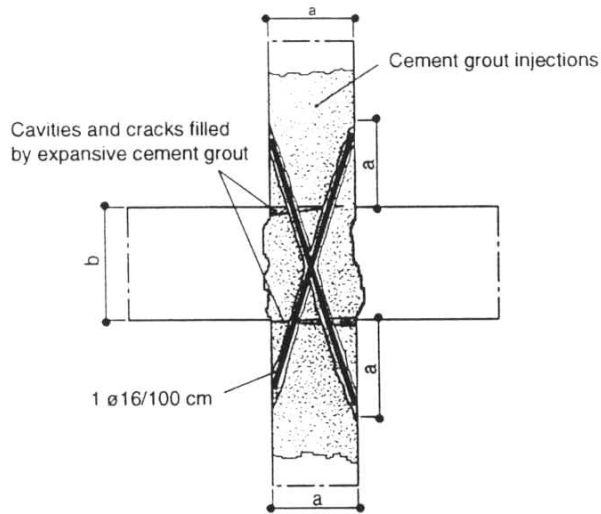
E: Seismic Strengthening : Wall-to-Floor Anchorage
